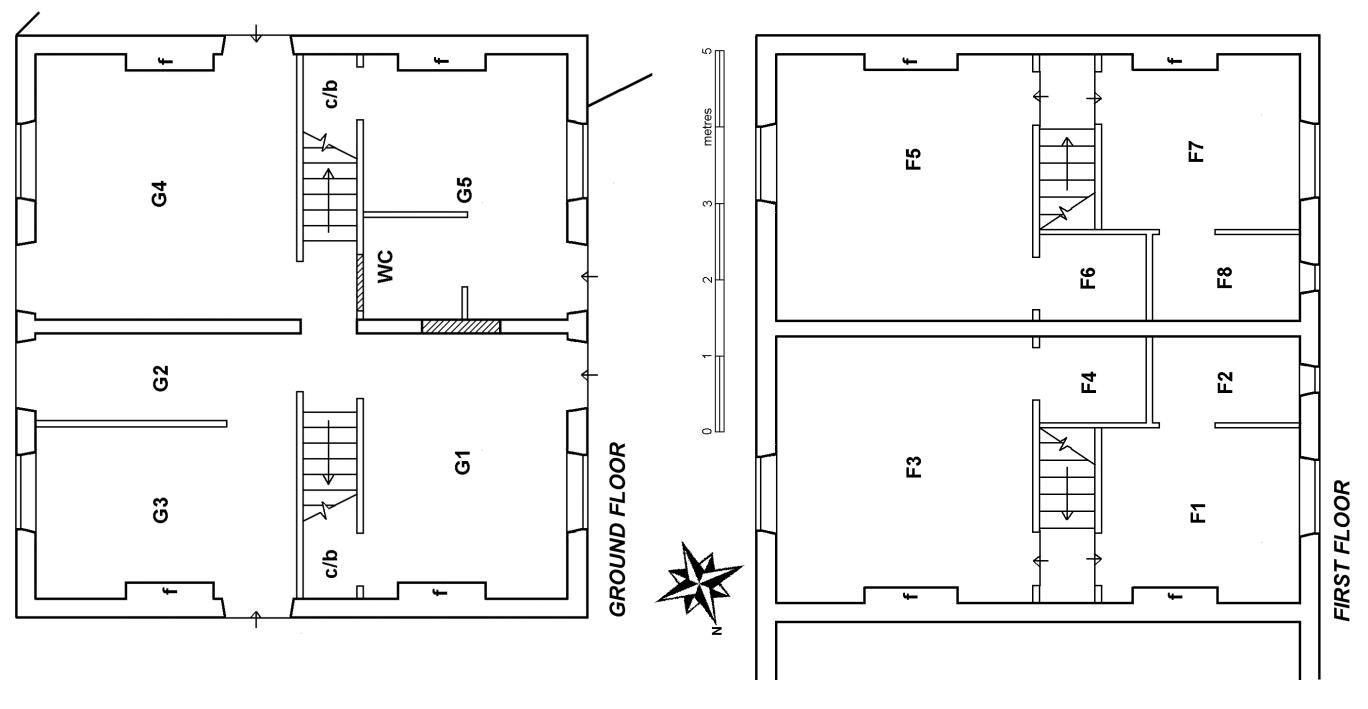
50-52 Diglis Road, floor plans (scale 1:50)
